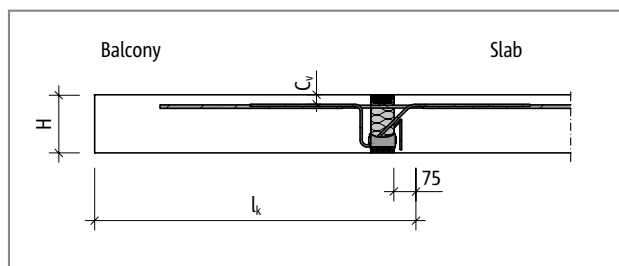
Schöck Isokorb® T type K-E, K-T: Static system, cross-section
